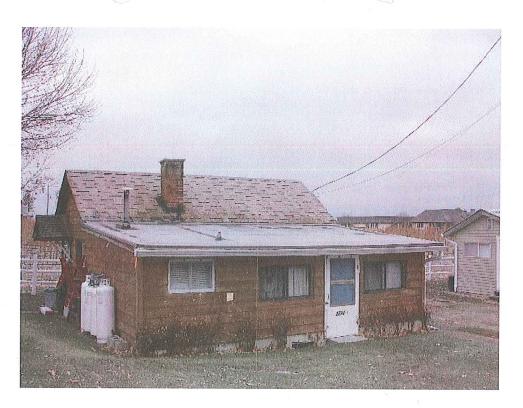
Unit C – Demolished November 2014. Single-bedroom single-story wood-framed residence. The 600 square foot unit was the original farm homestead with an undetermined age
